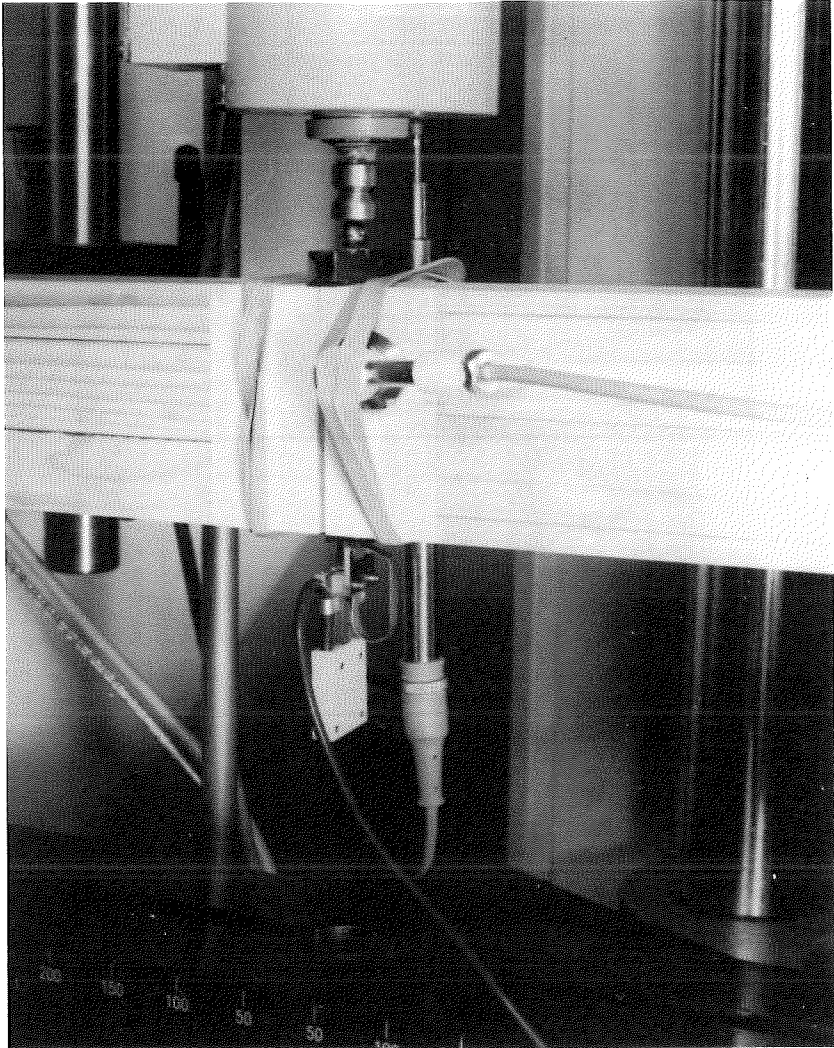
Detail of test set-up with AE-transducers and crack opening COD gauge
